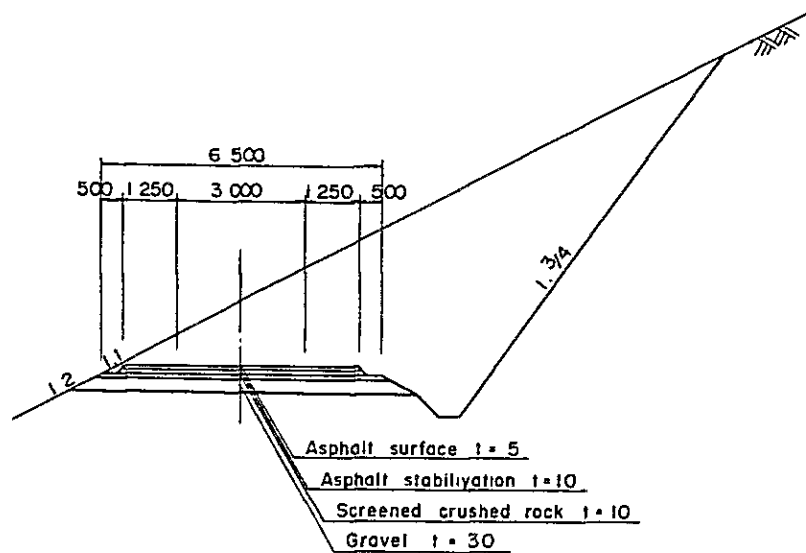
Typical Cross-Section of Coclesito/Petaquilla Section (Asphalt Proposal)
